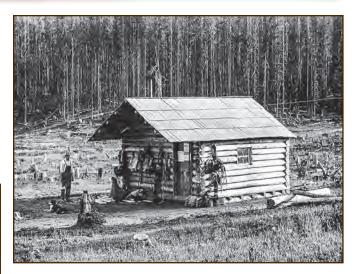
The log sleepers that support the Clearwater Springs Ranger Station cabin are clearly visible under the log floor joists in this photo. The builders constructed the cabin in 1913 and used it as a summer station in the Blue Mountains (Pomeroy Ranger District, Umatilla National Forest, Pacific Northwest Region).
